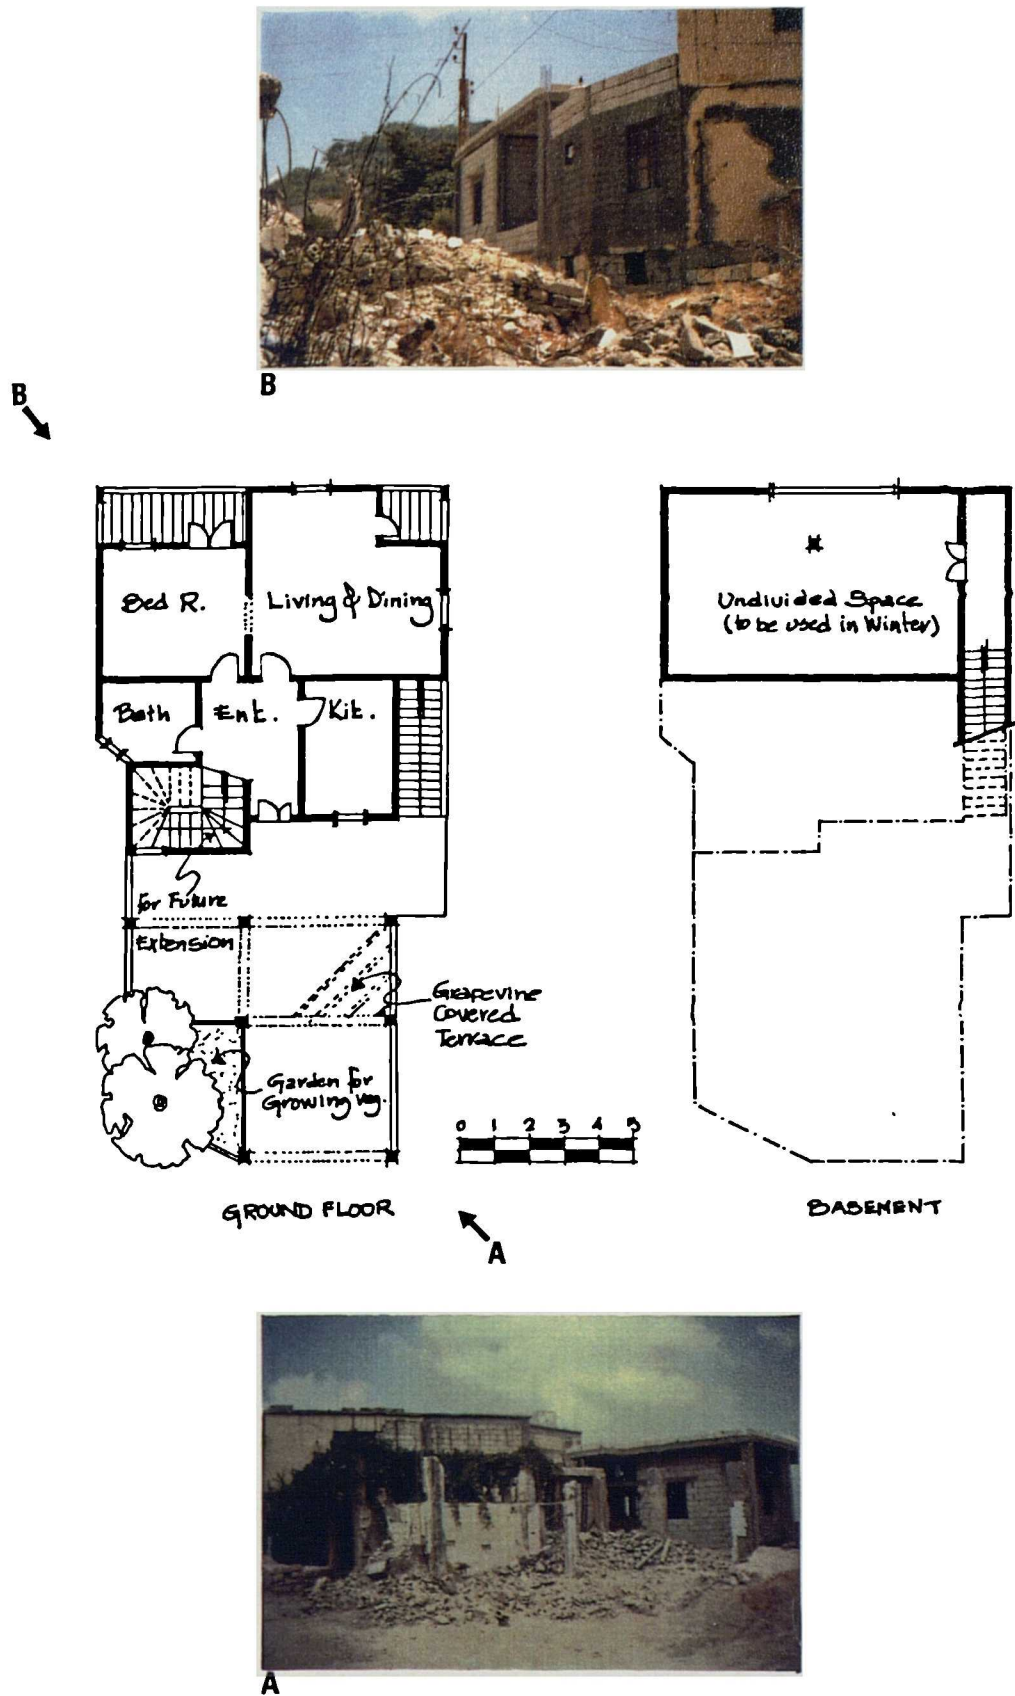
Family No. 2; Plan and Views of Reconstructed Dwelling in al-Burjain.
